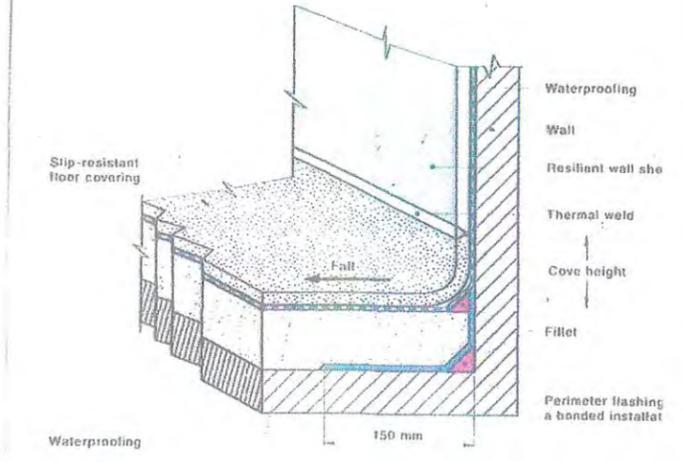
(B) - Vinyl installation - Welded method
